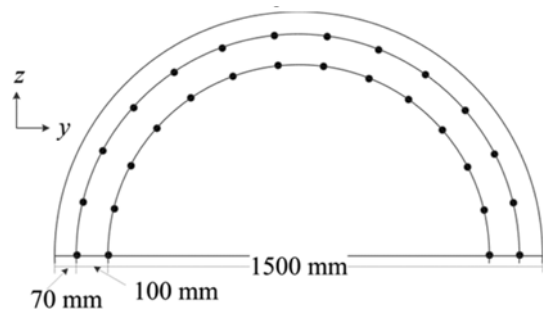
Assumed Reinforcement for Pile B7 in this Study
